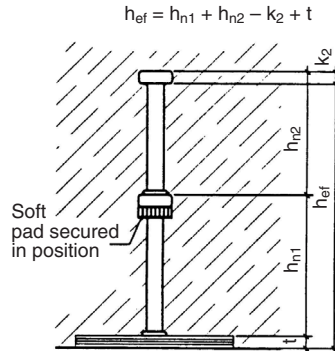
Two headed studs welded together with a soft pad placed beneath the head nearest the surface
